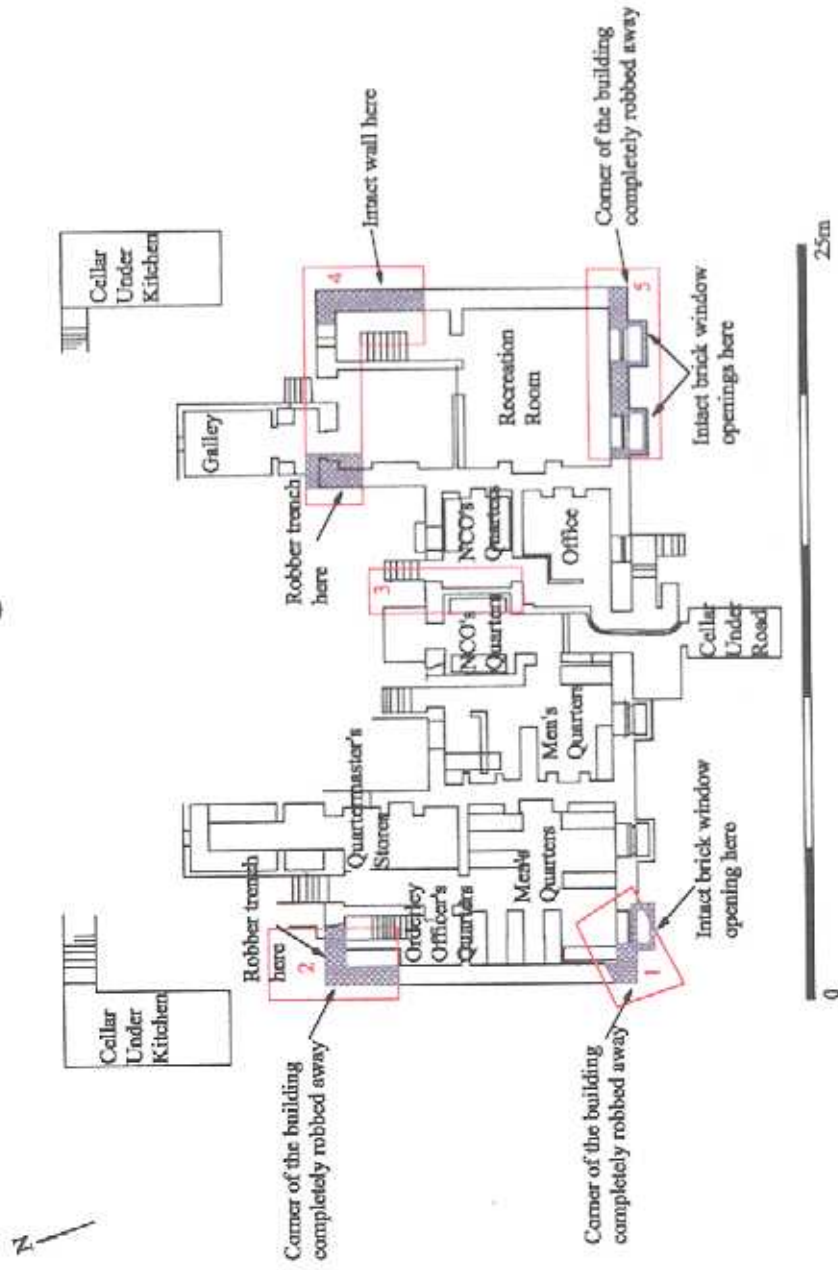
Plan of the basement of the building taken from an original drawing, showing approximate locations of the trenches and located robber trenches and surviving stretches of wall. PHG04/20
